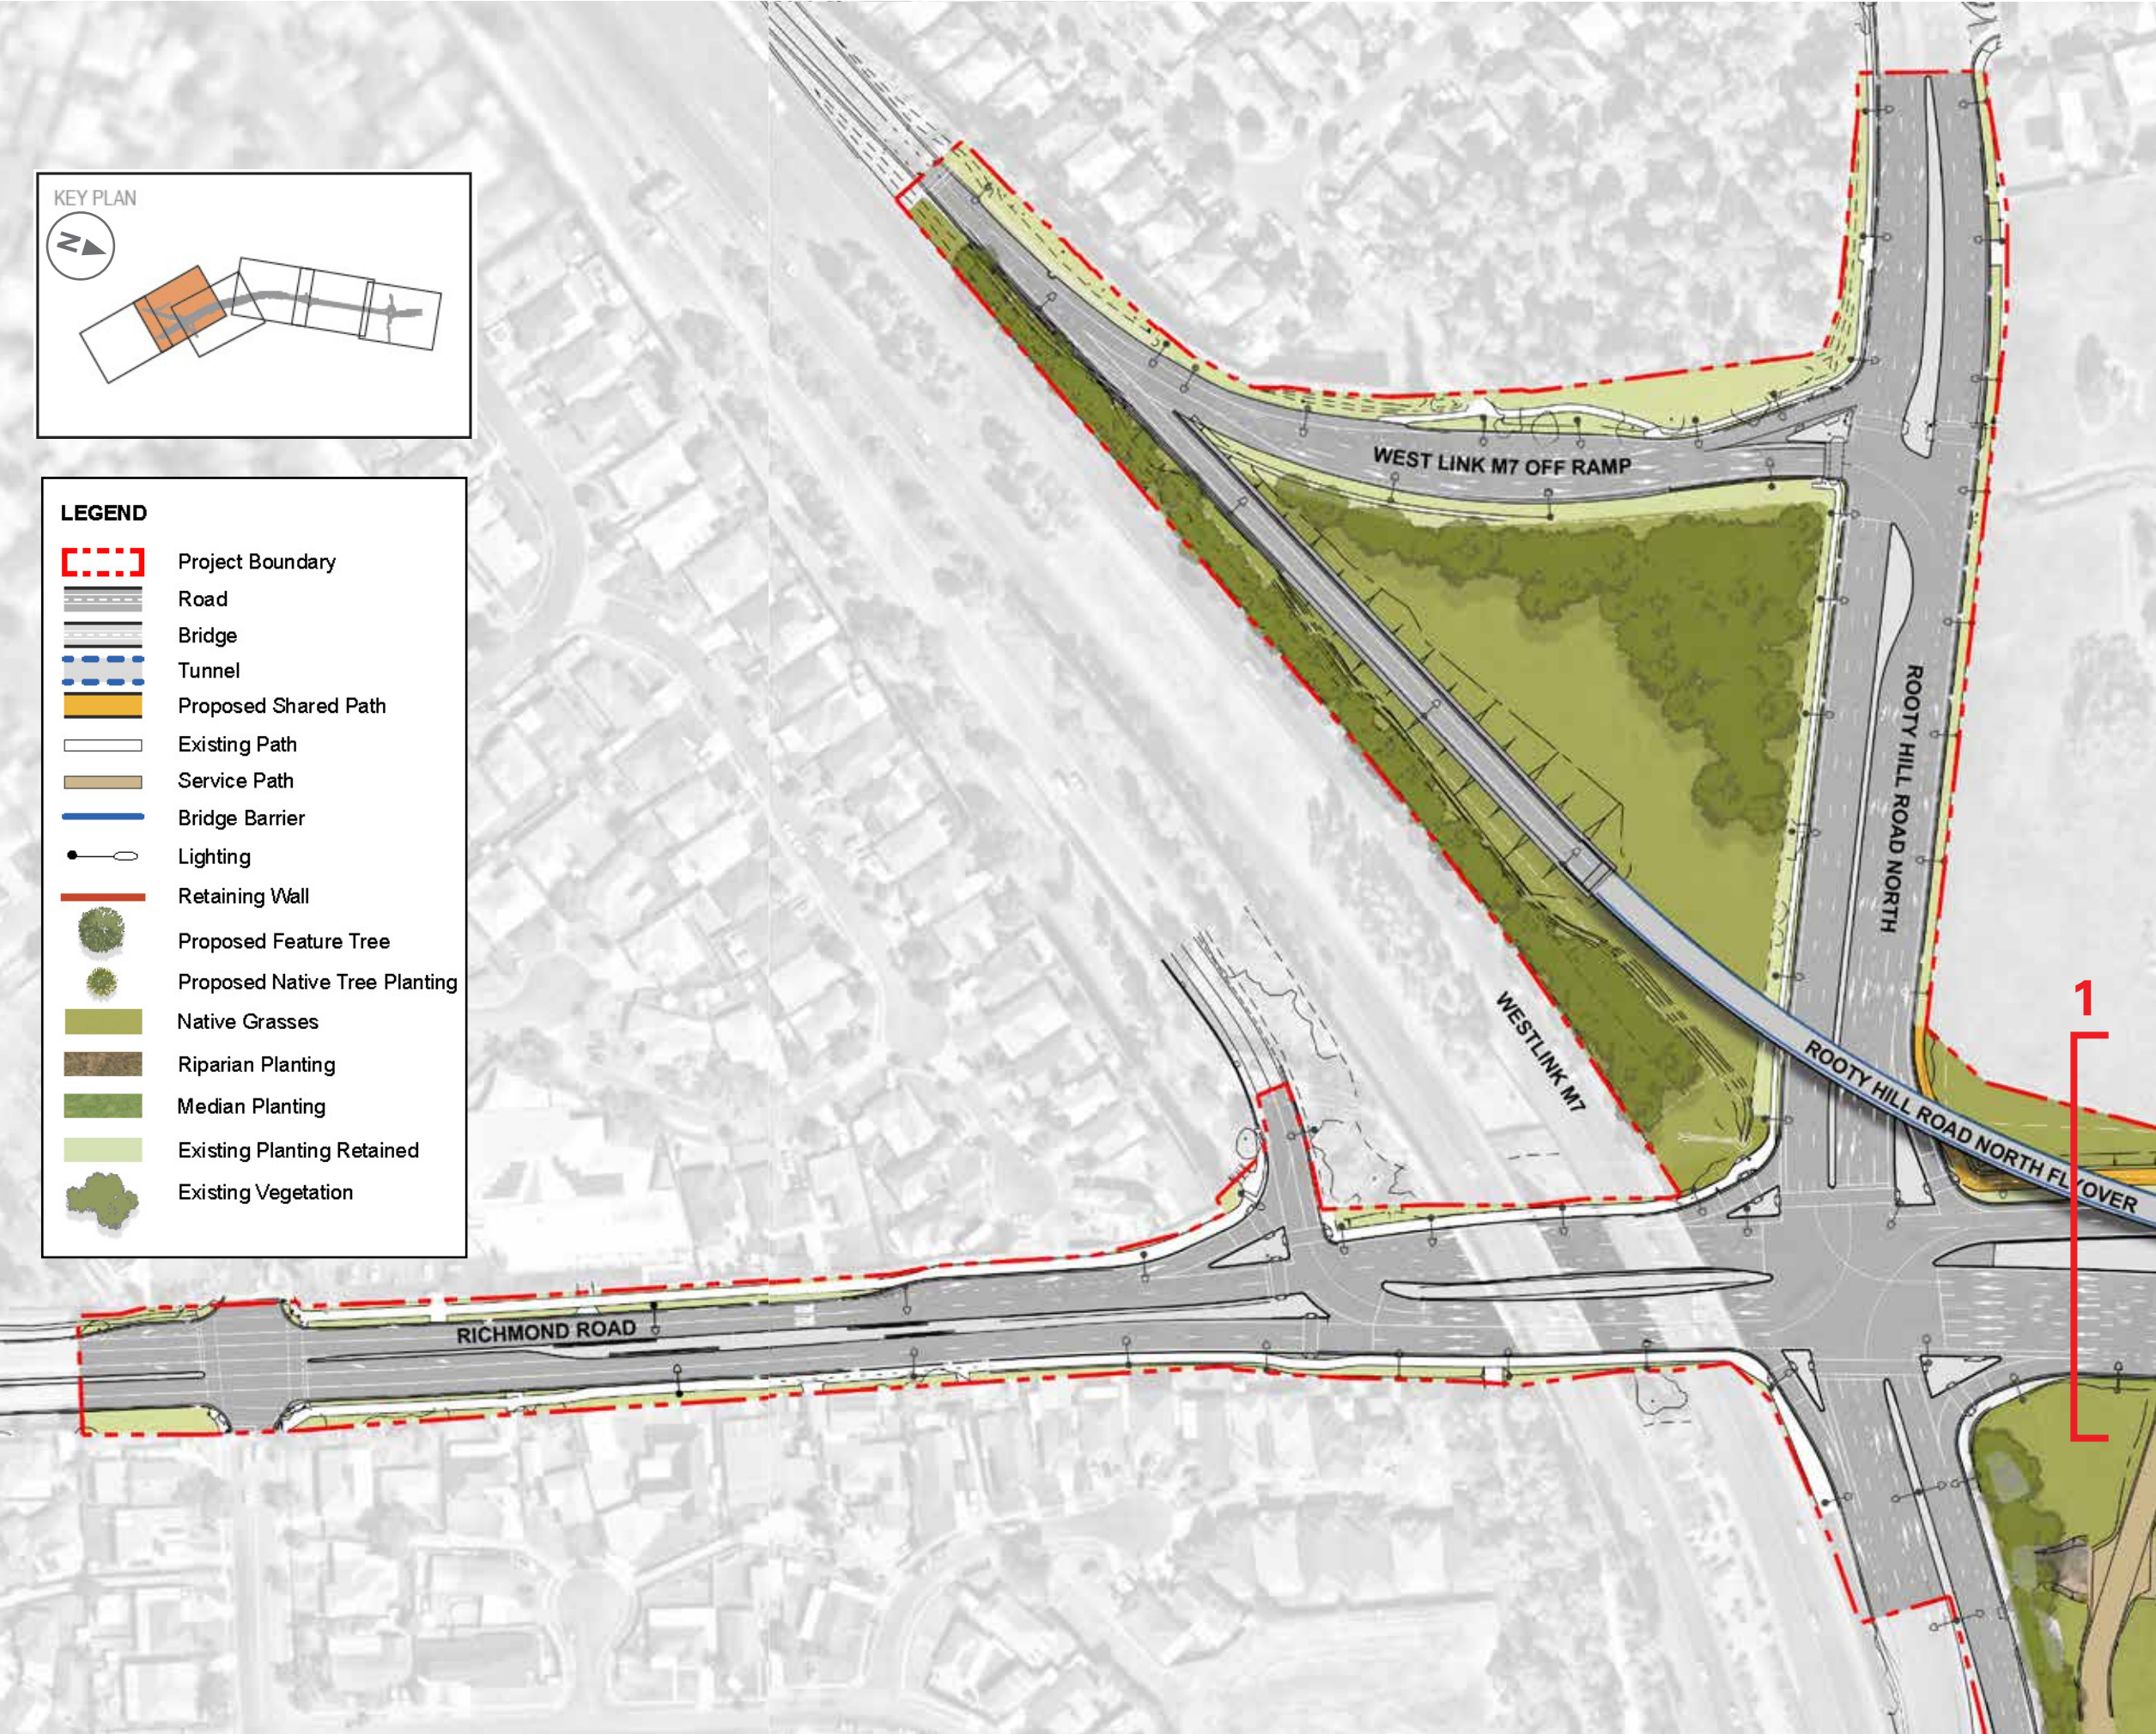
Urban design concept plan sheet 1 SCALE 1:2000
